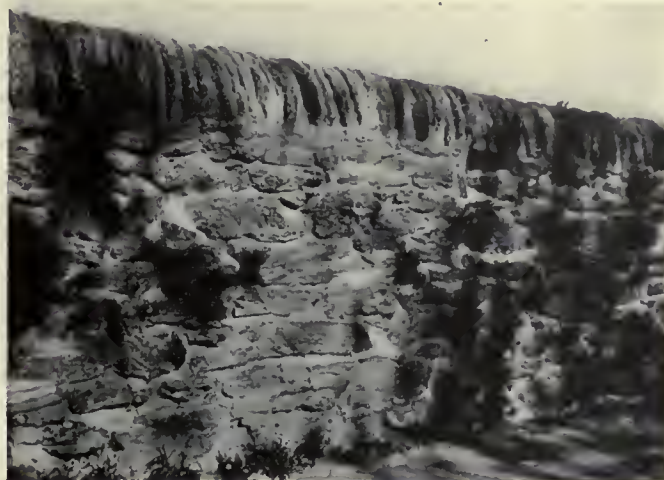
Old Stone Wall, Lower Burying-ground Germantown Avenue, Germantown, Pa.
